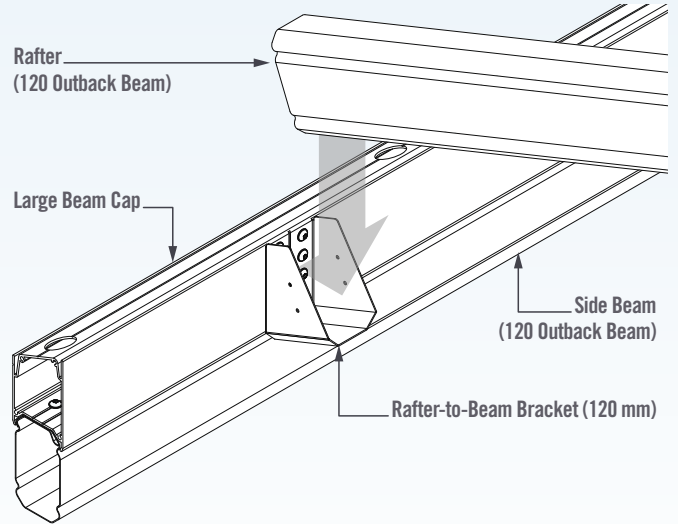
LARGE BEAM CAP - 120 SIDE BEAM - 120 RAFTER
